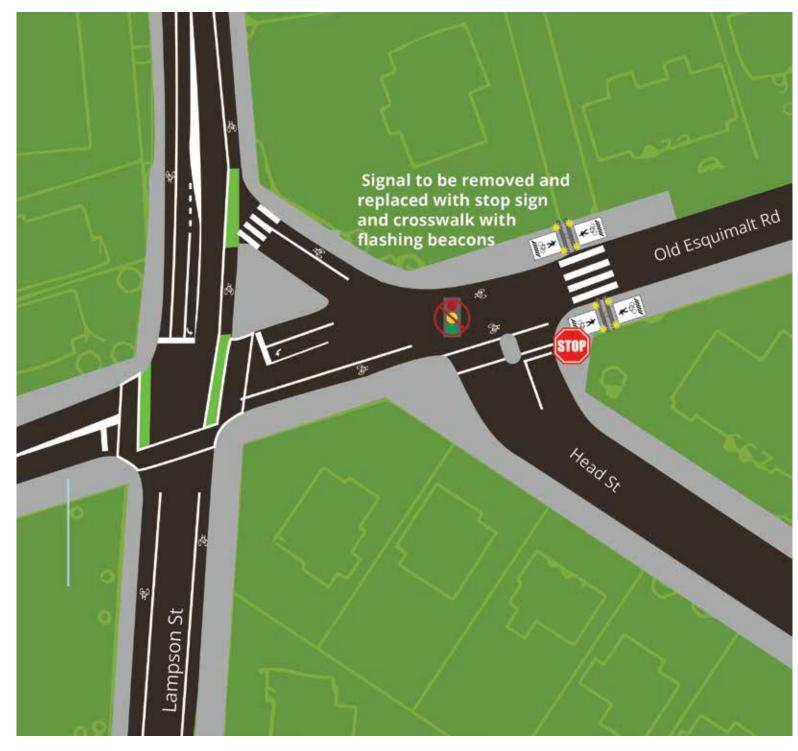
IMAGE: REPLACEMENT OF TRAFFIC LIGHT WITH CROSSWALK AND FLASHING BEACONS
